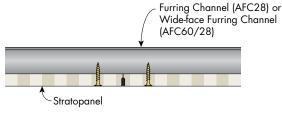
Long Edges - UFF Joint Stratopanel Suspended Ceiling Section
